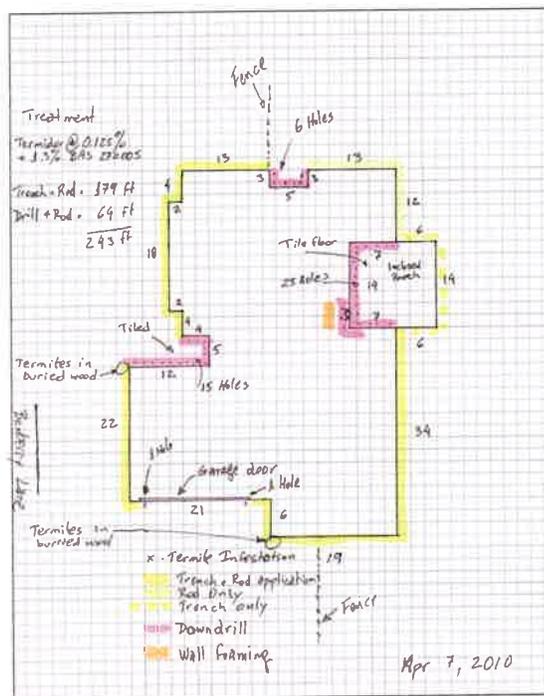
Diagram indicating treatment situations for both horizontal short-rodding and long-rodding beneath concrete slab structural elements.
